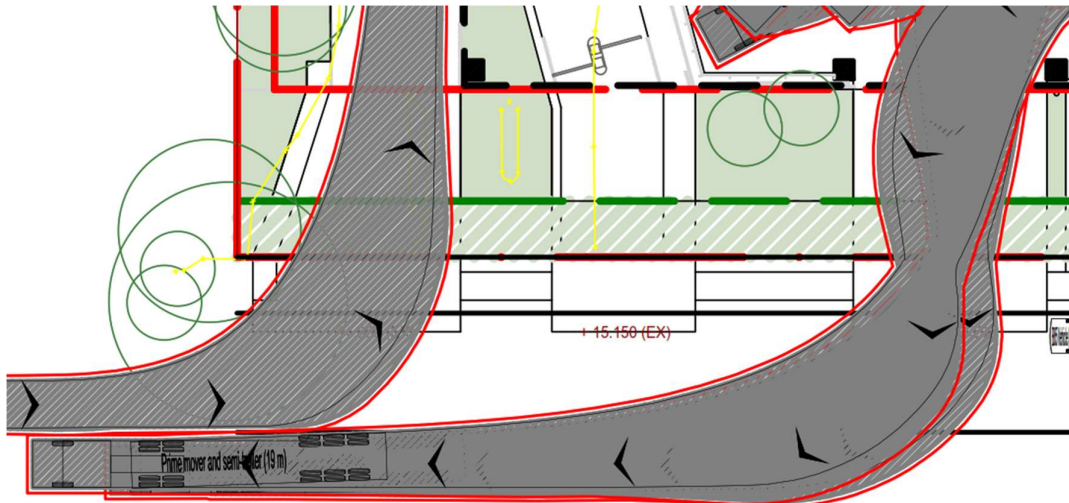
Truck driveway entry to level 1 and truck driveway exit from ground floor:
